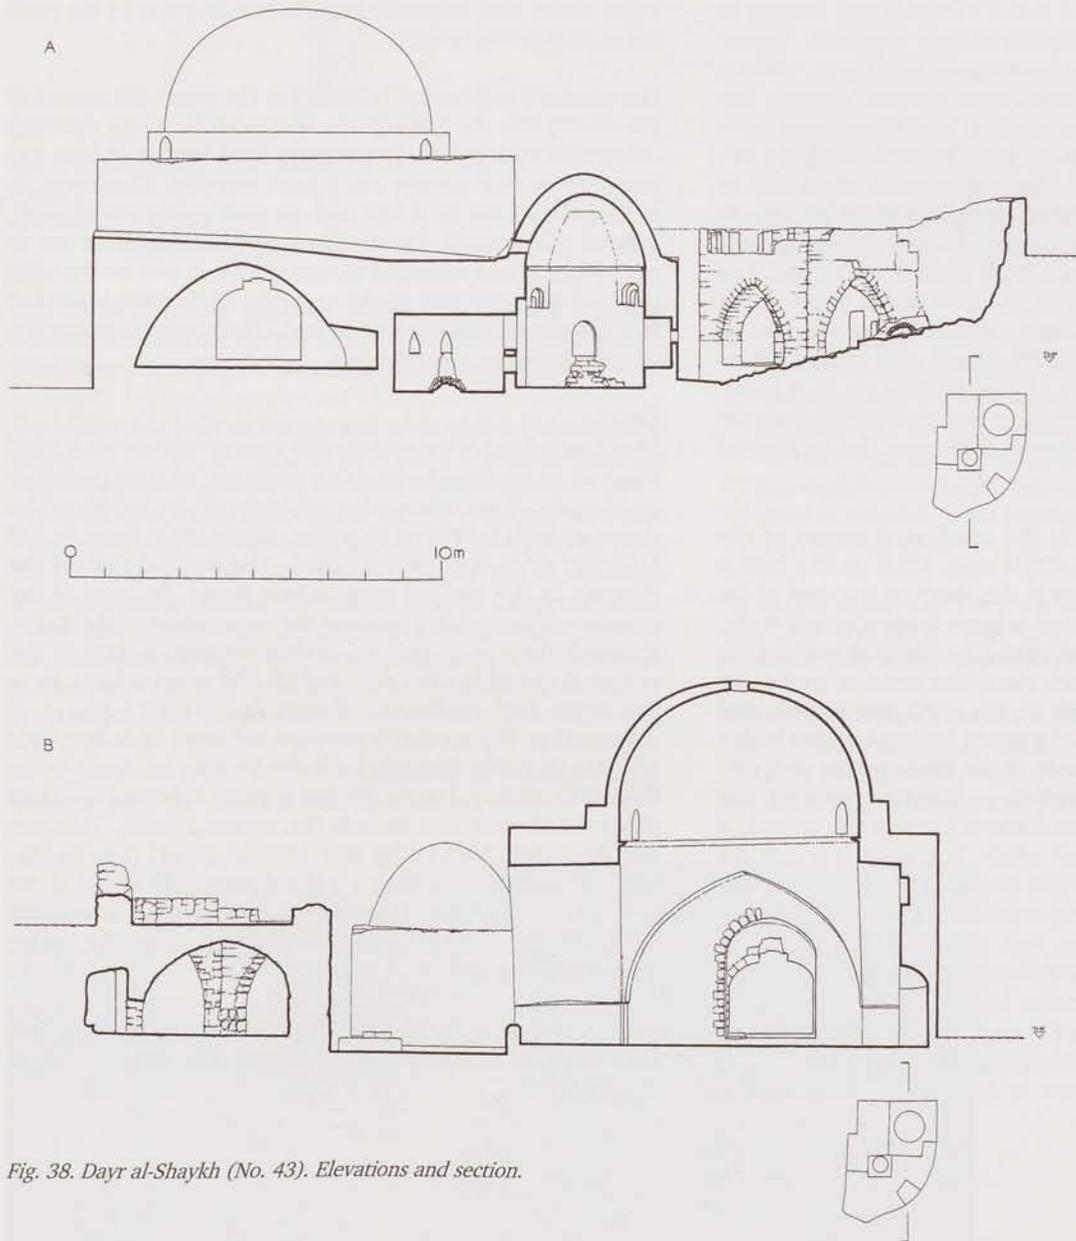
Dayr al-Shaykh (No. 43). Elevations and section.
